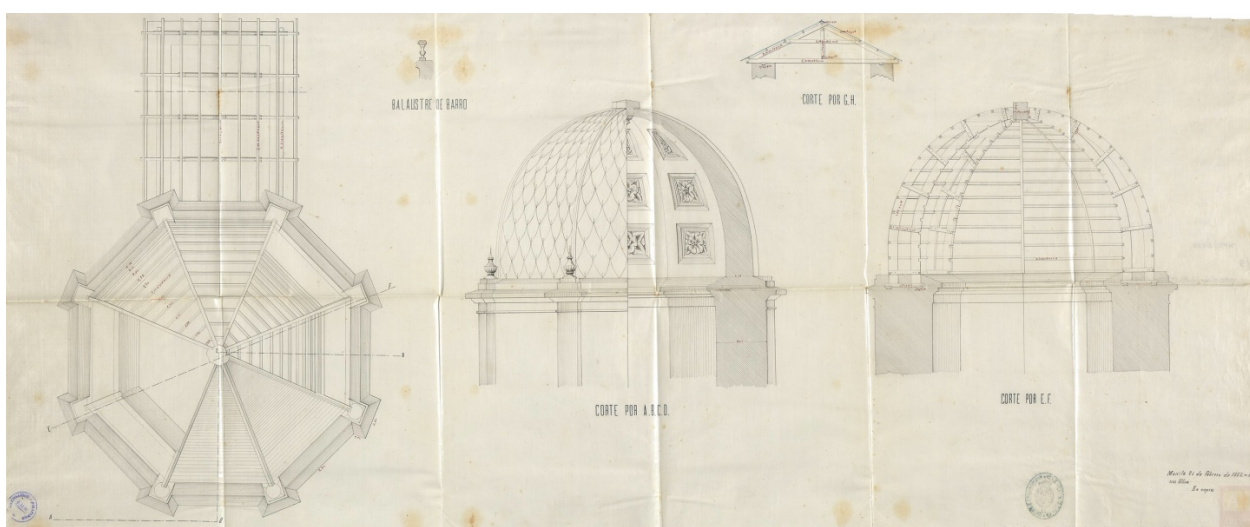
Plan for the construction of a new cemetery for Manila and its arrabales. Plan for the chapel and sacristy: roof, 1882.
